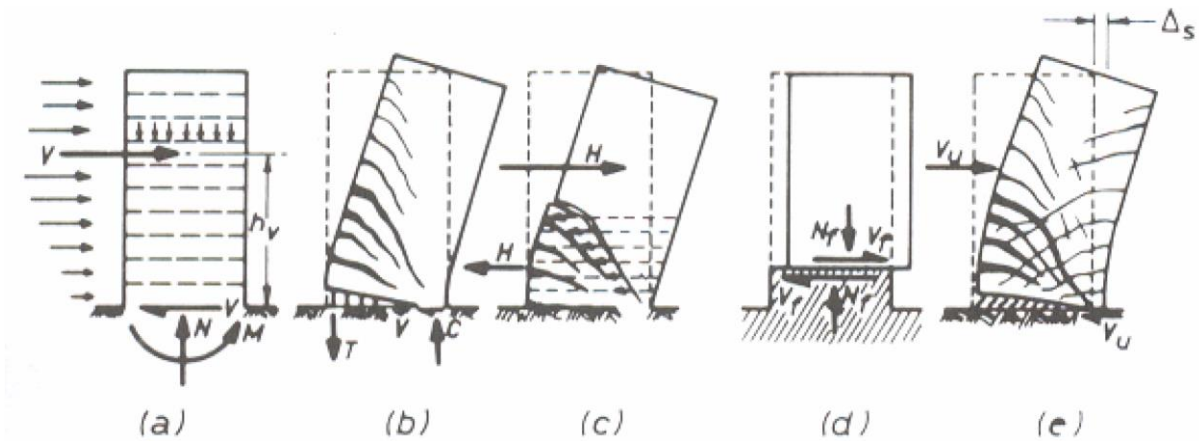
Common 2D failure modes exhibited in structural walls (Paulay and Priestley 1992)
